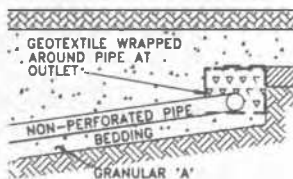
Lateral section through new outlet (Raymond et al., 1996).
